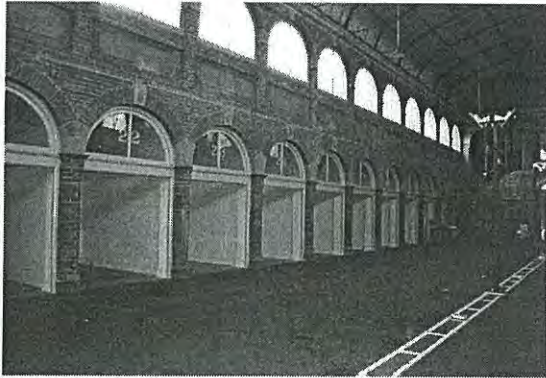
Interior, Exchange Hall (space H01). View of south wall (west end) showing arcaded booths.
